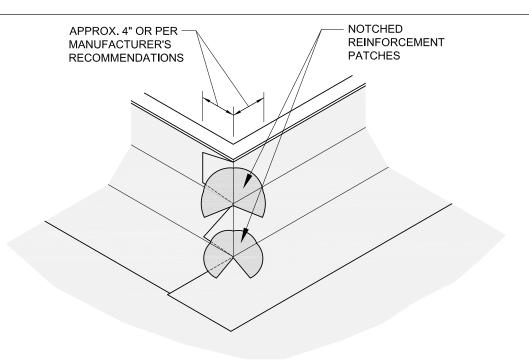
BUR~and~polymer-modified~bitumen~roof~membrane~outside~corner~flashing~application
